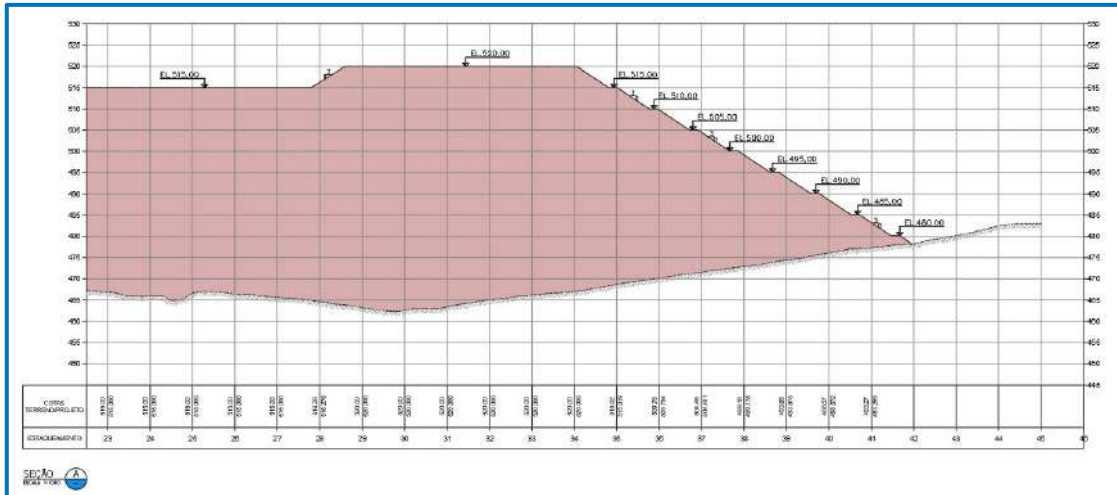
Vertical Cross Section of the Filtered Tailings Pile – Dikes 1
